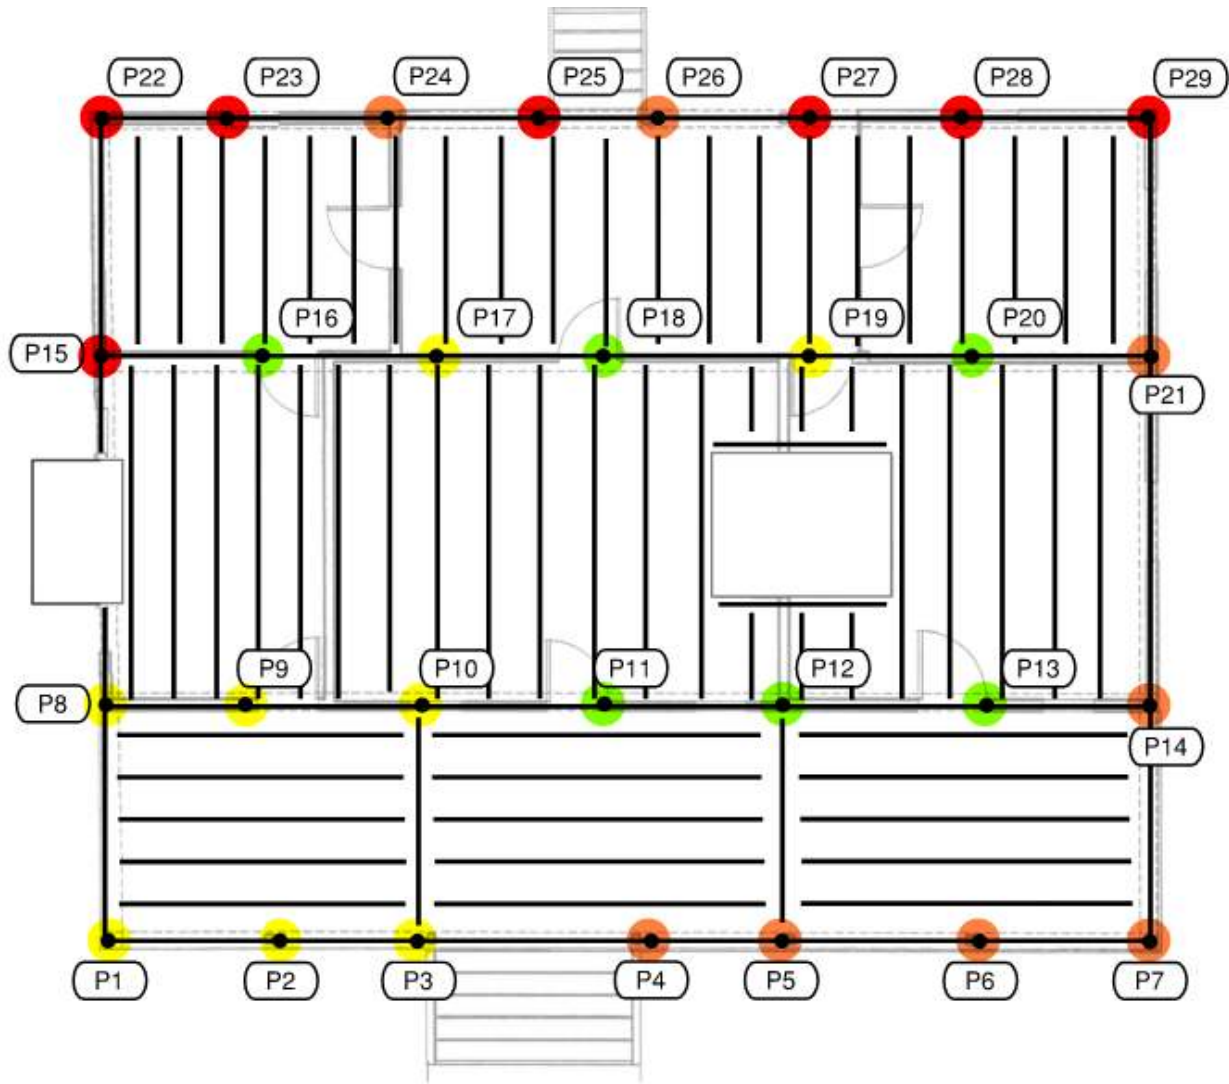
Schematic floor framing plan graphically showing condition ratings for foundation piers: Good (green), Fair (yellow), Poor (orange), and Failed (red).
